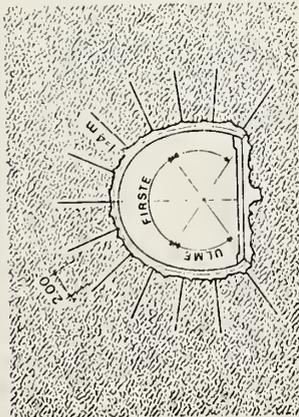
GROUNDCLASSES FOR ARLBERG TUNNEL, AS-BUILT
